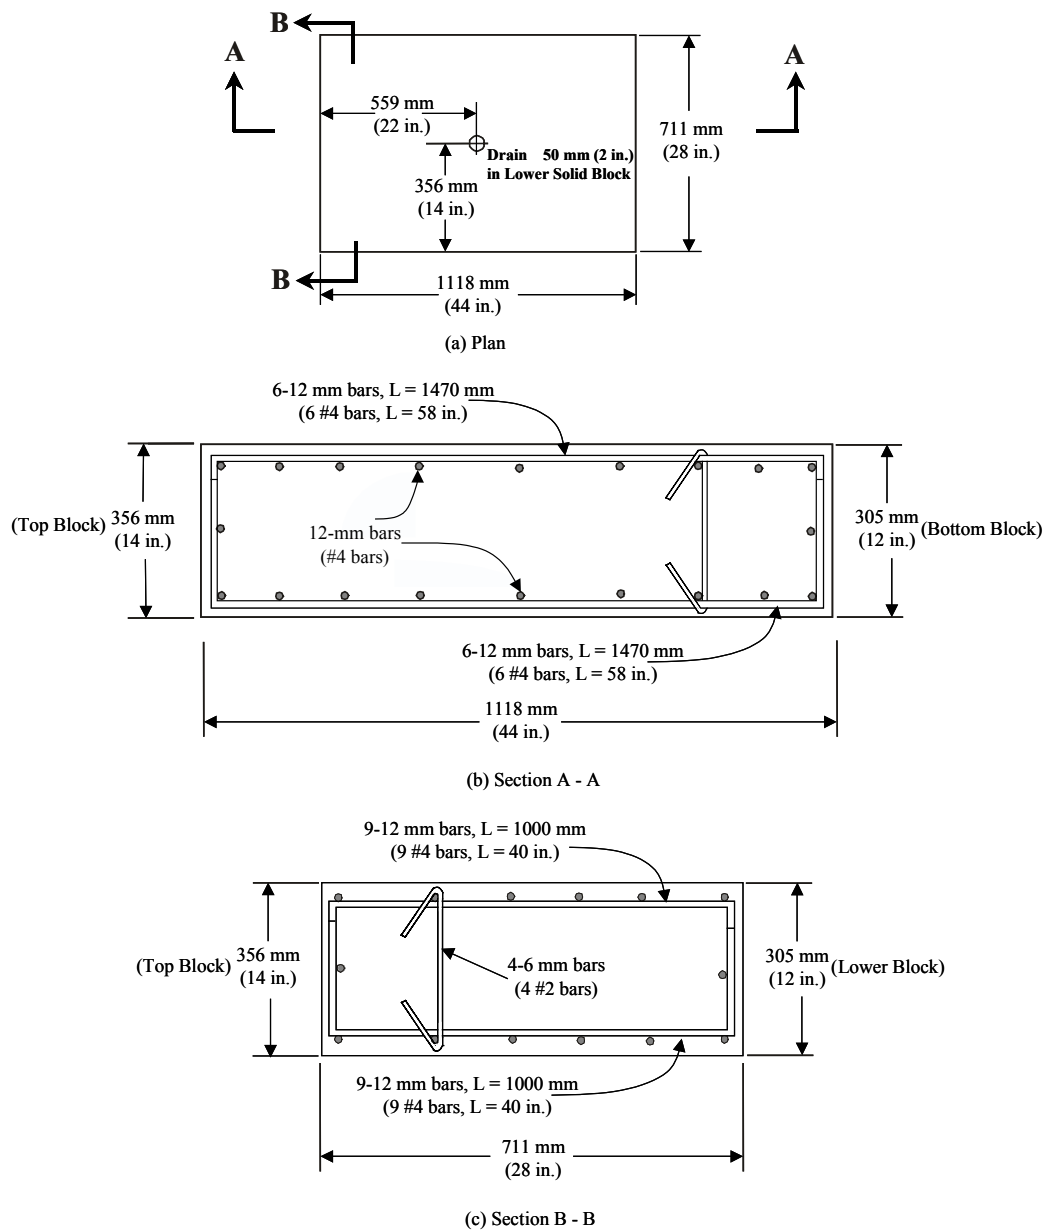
Reinforcing details of the Top and Bottom End Blocks
